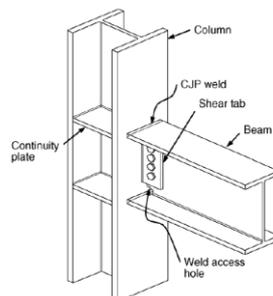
Typical pre-Northridge beam-to-column moment connection.
